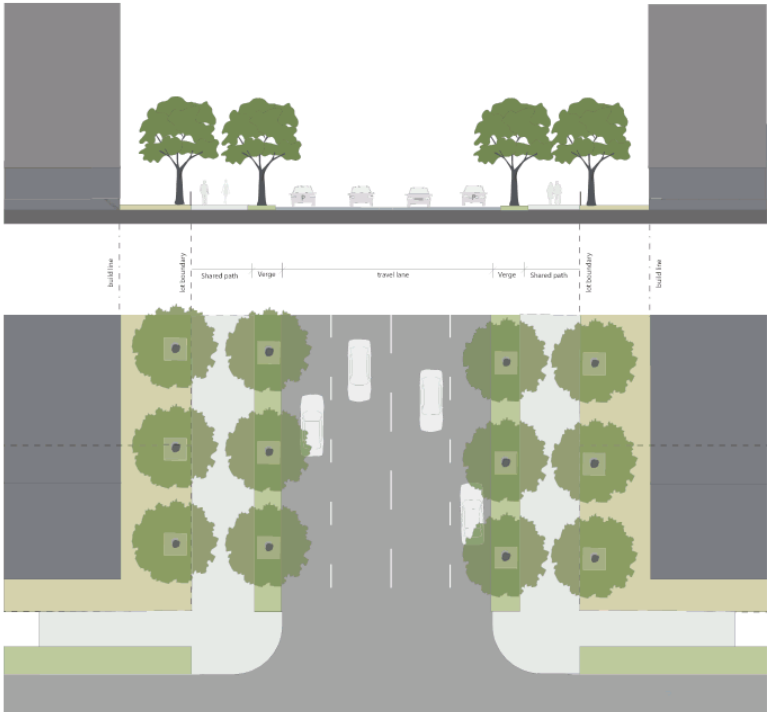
PROPOSED TYPICAL CROSS SECTION OF BAY STREET
